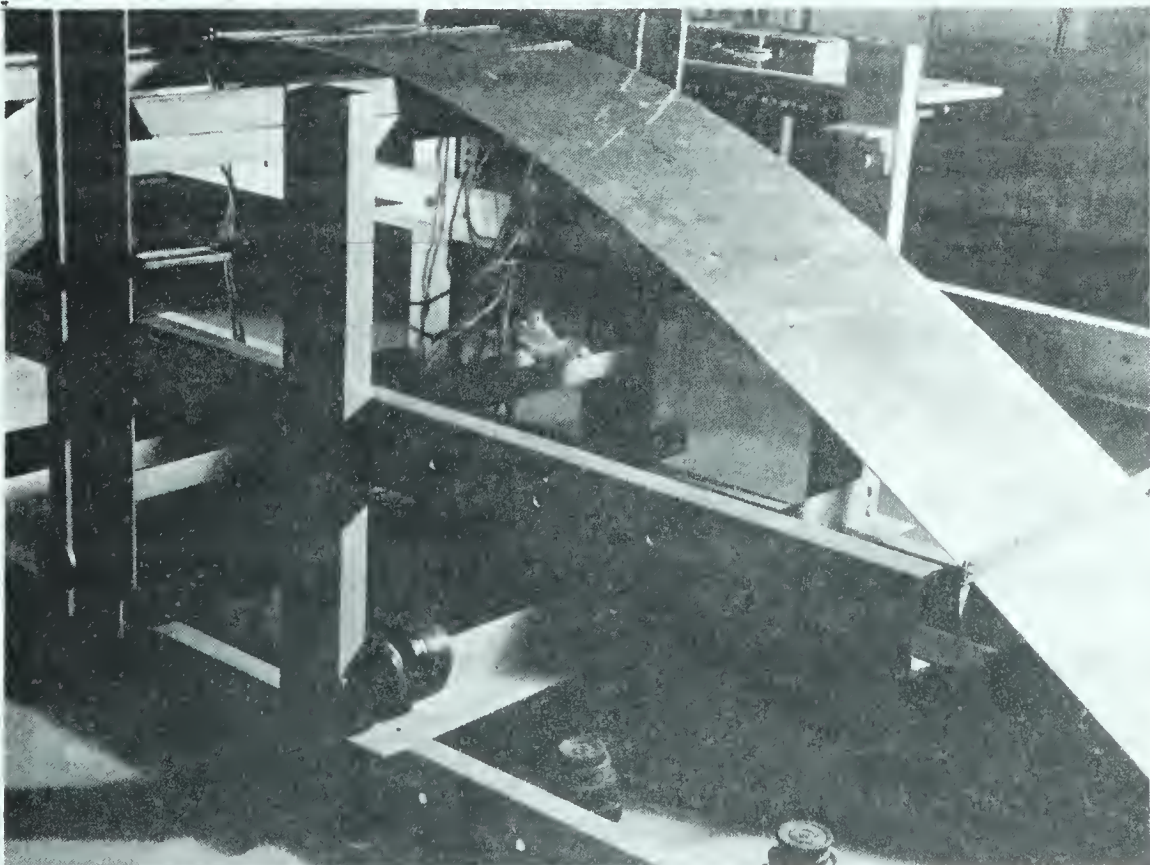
PLATE UNDER LOAD ON TEST FRAME
